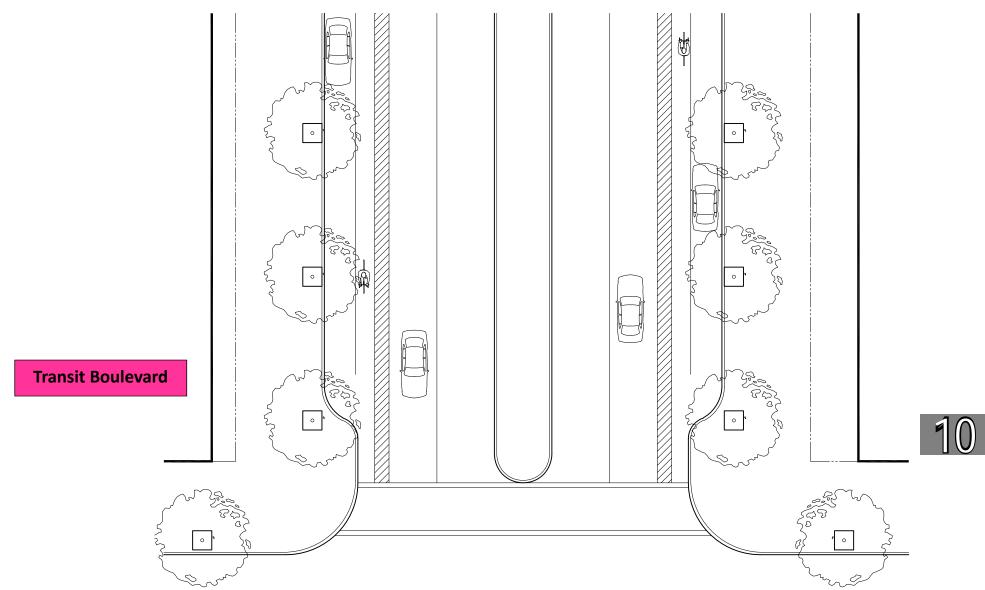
Street Type 5: Typical Intersection (Plan View)
